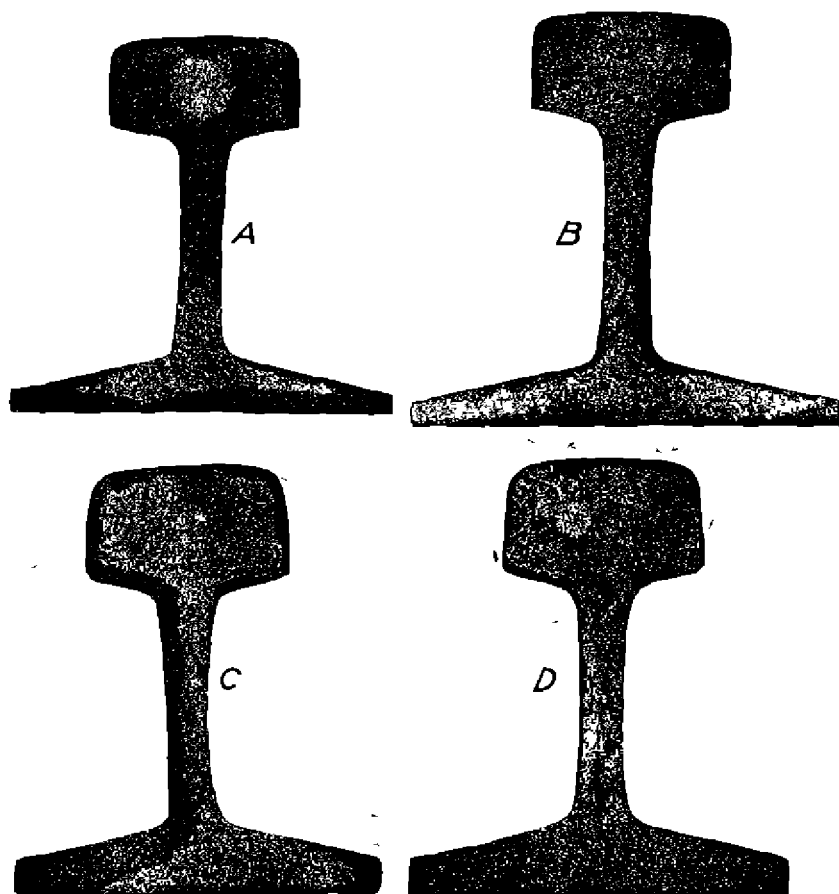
Four transverse fissures developed in new rails by progressive gaging. Sections marked 'A' and 'B' were 85 pound rails. Section A was loaded over center of head. Section B was loaded on right side of head. Sections C and D were 100 pound rails. Section C was loaded over center of head. Section D was loaded on left side of head.
